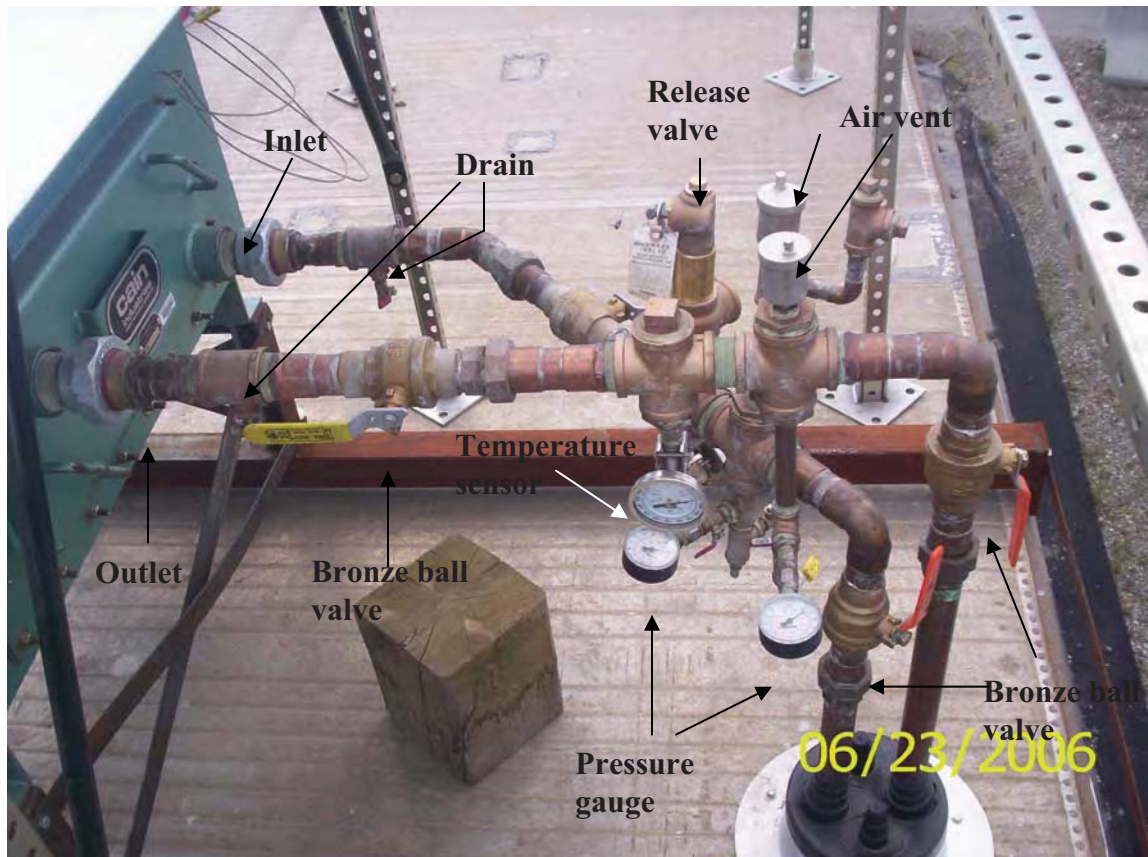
Heat exchanger inlet/outlet pipe connections.
